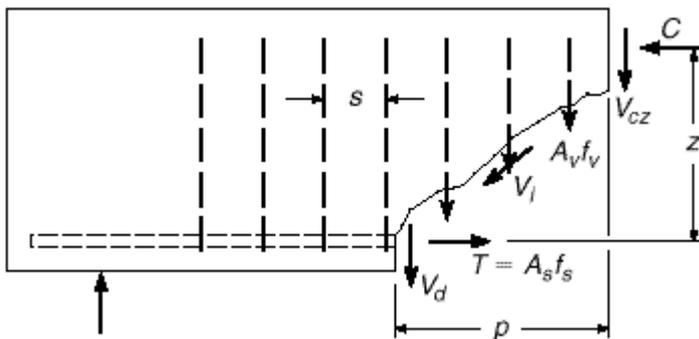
Forces at diagonal crack with Vertical Stirrups (Nilson)
